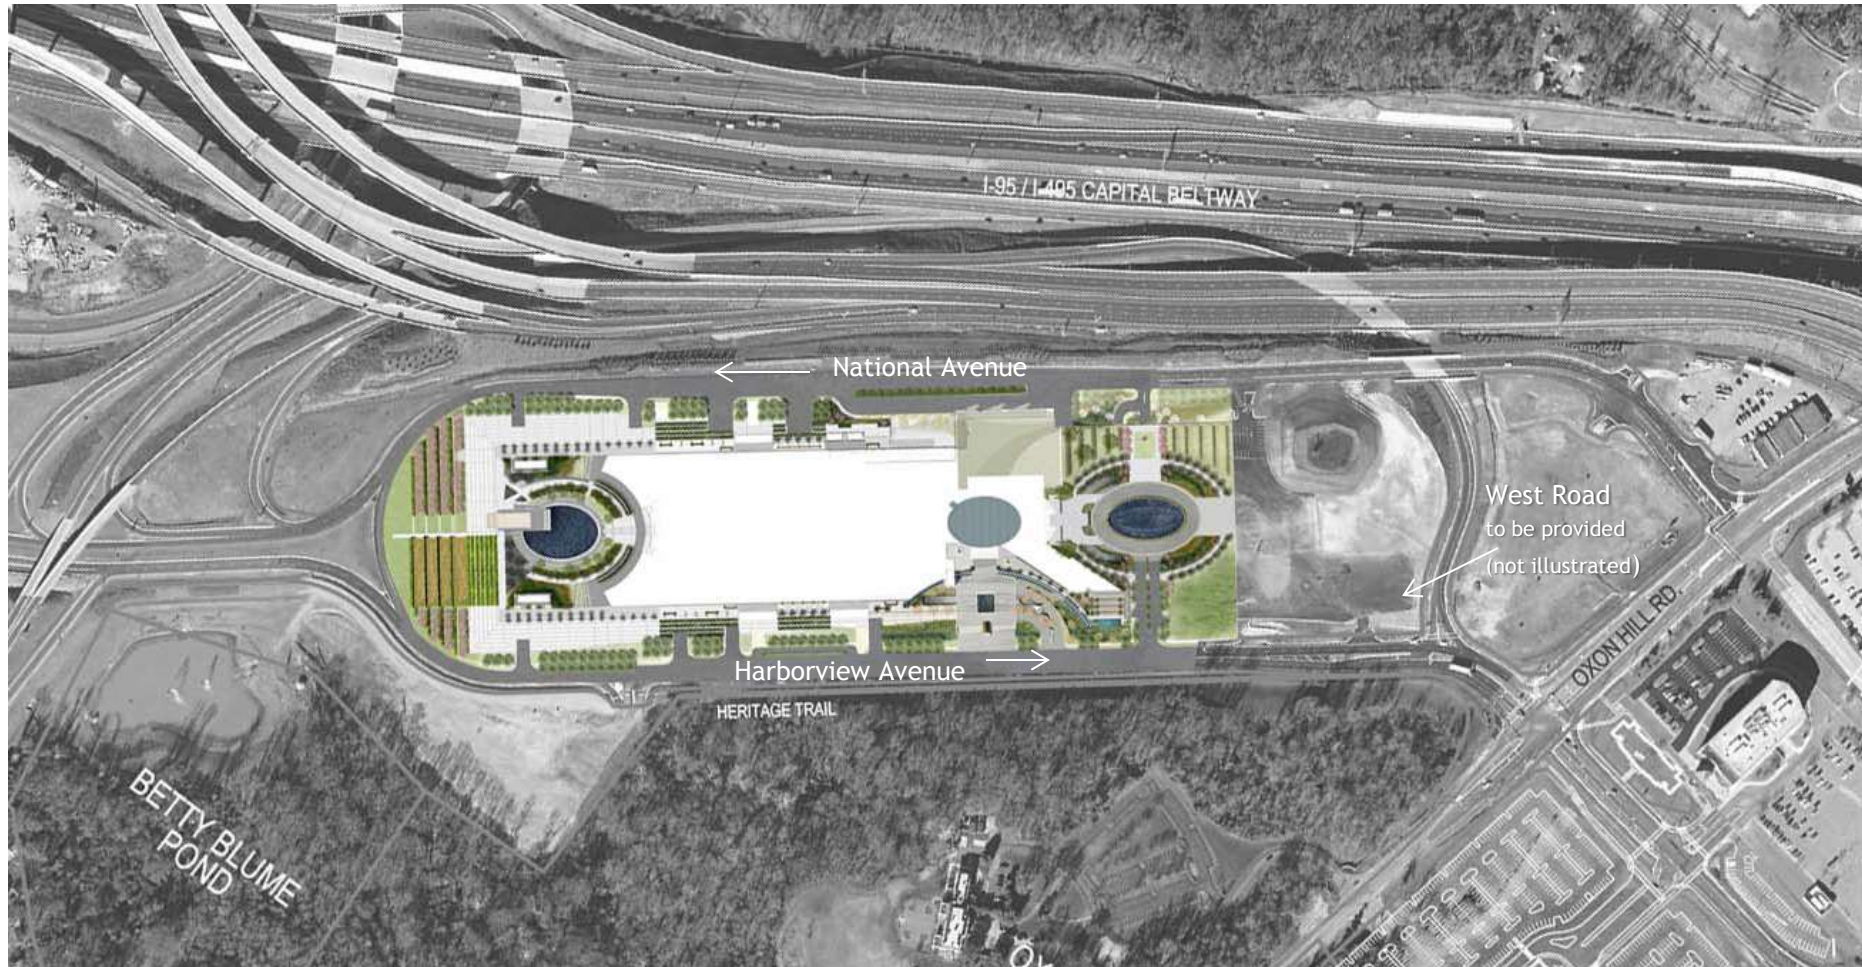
DETAILED SITE PLAN SET (PAGE 2C OF 10)
